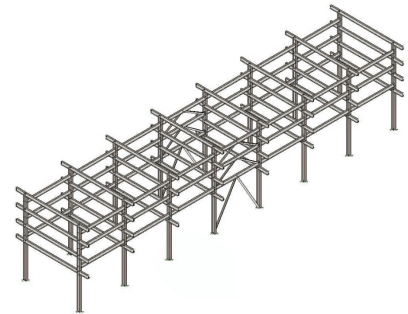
Typical four-level pipe rack consisting of eight transverse frames connected by longitudinal struts.
